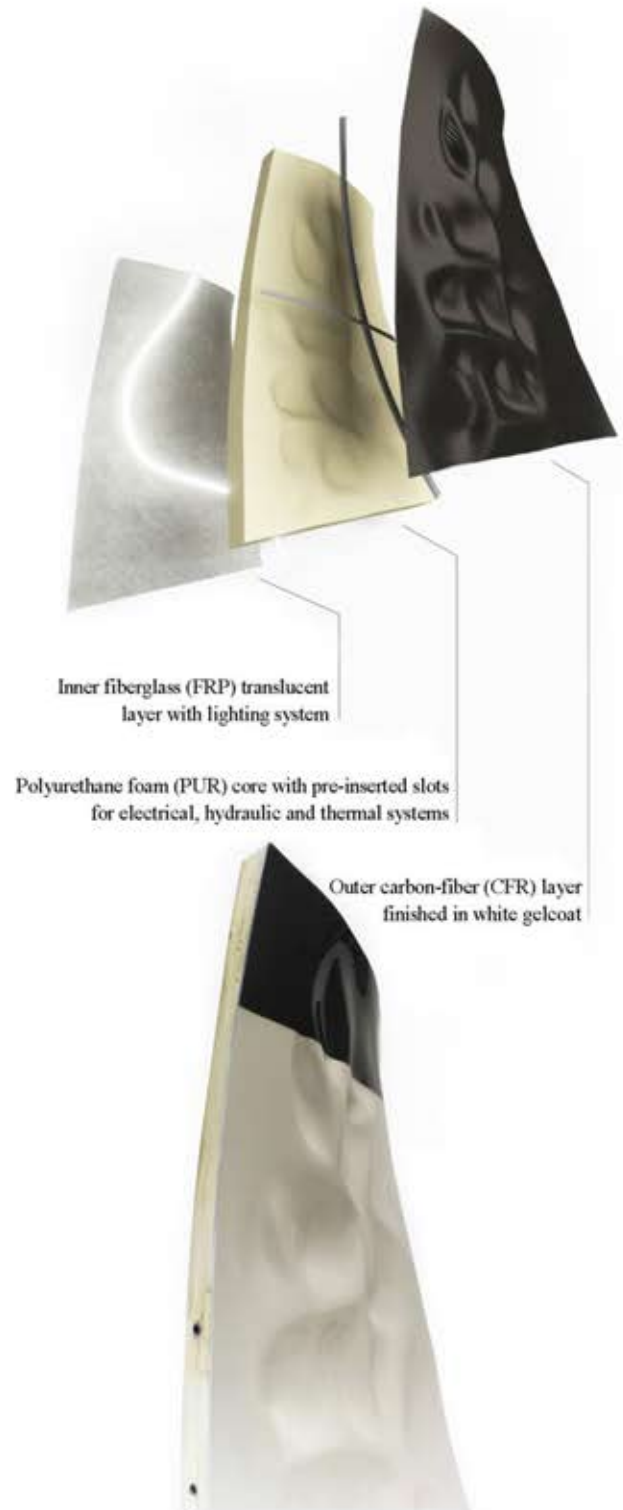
Picture of the fabricated prototype and exploded view showing the different layers [7]
